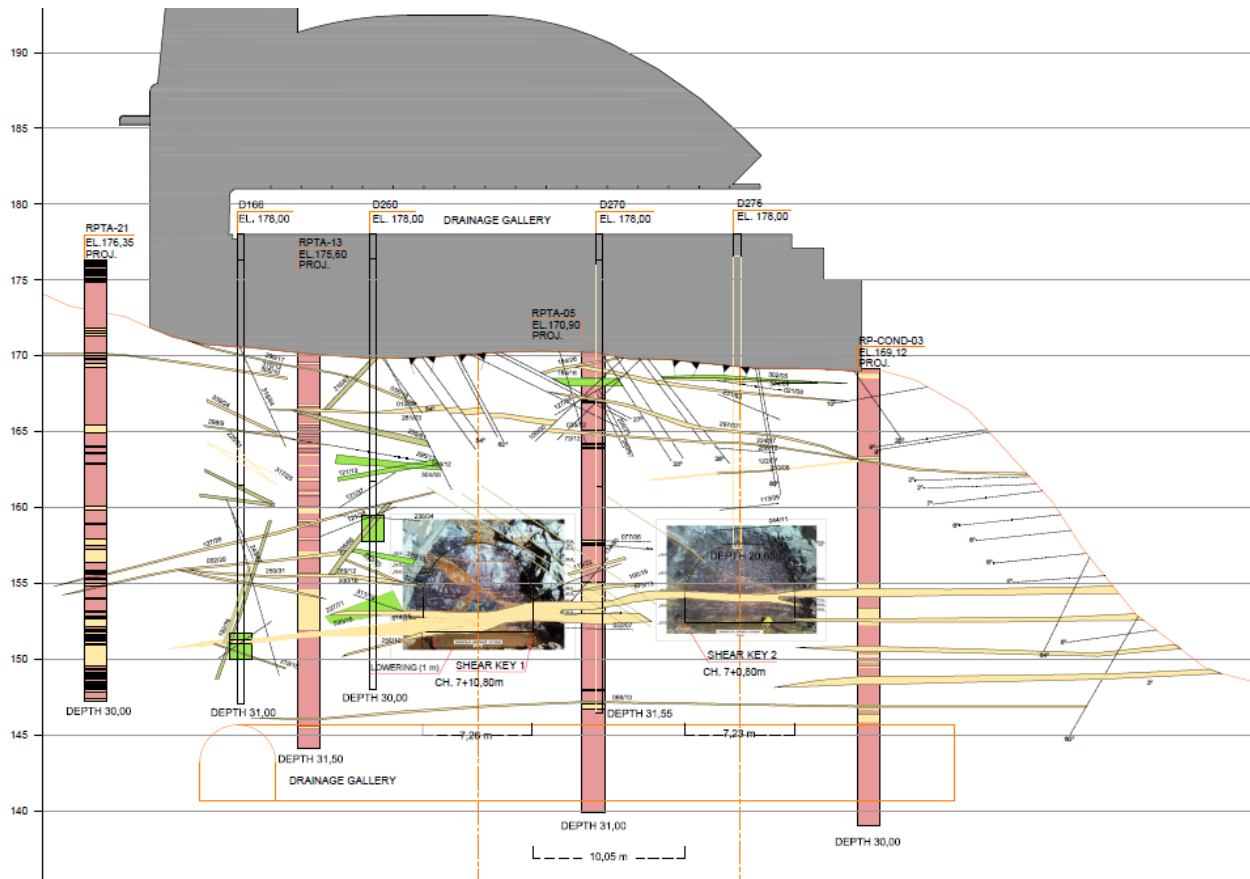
Water intake structure foundation cross section with master joint and secondary parallel joints
